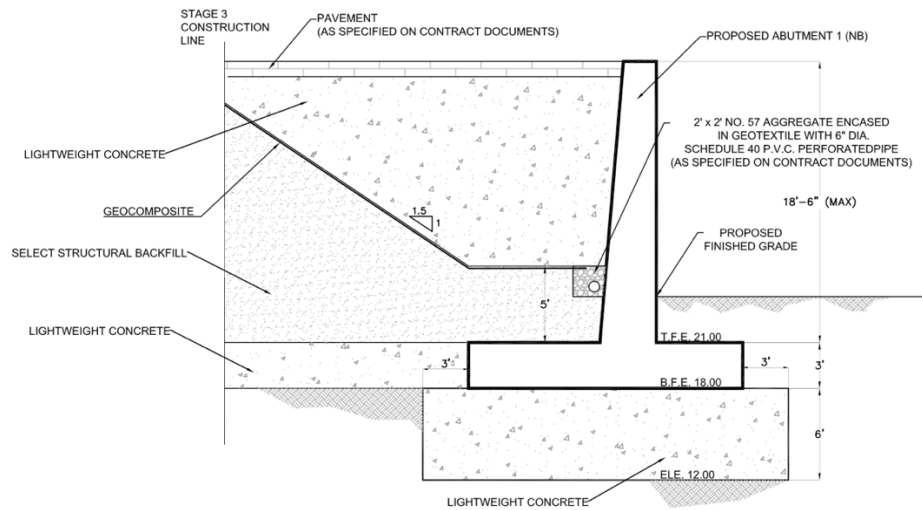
Typical cross section for Abutment 1 (NB) (0095 Over Marlborough Street, S-26901).
